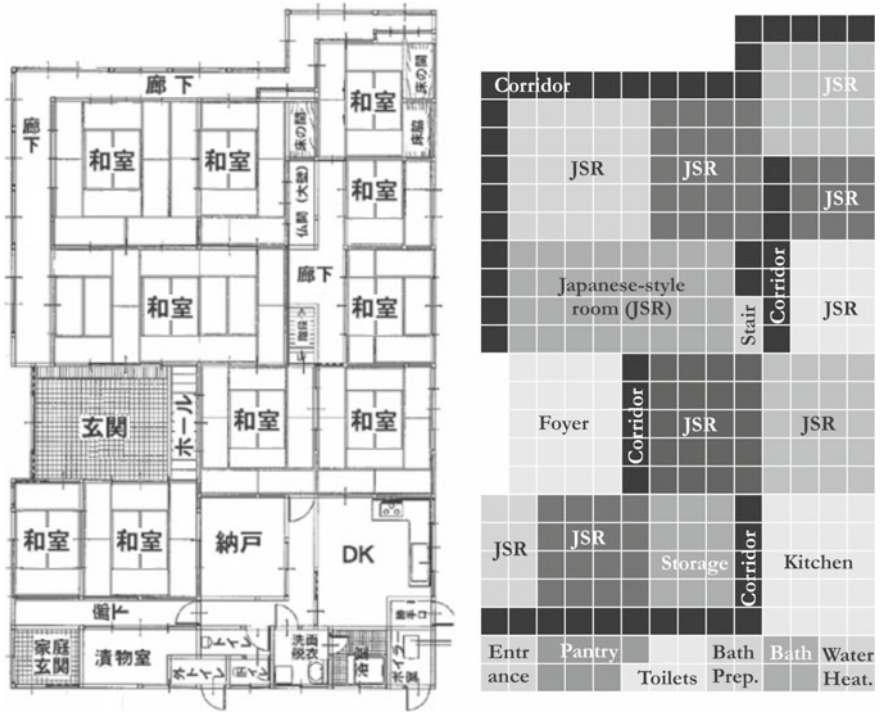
Left A floor-plan of a Japanese traditional guest-house. Right the same layout transformed into a square grid. JSR stands for “Japanese-style room”
